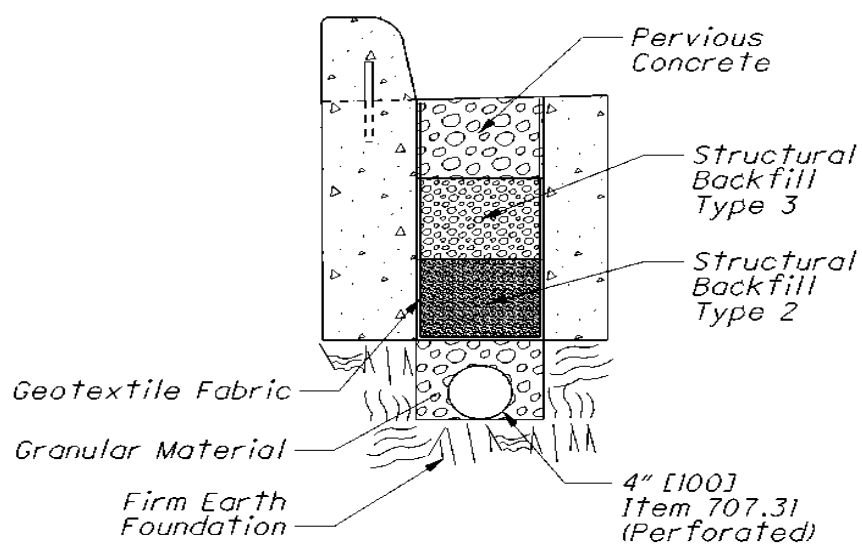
Exfiltration trench cross section: Standard construction drawing: WQ-1.3 ODOT (ODOT, 2010)
